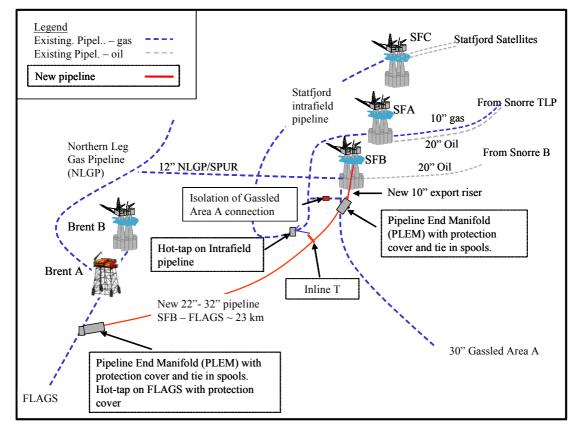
Proposed layout of the SFLL project gas export pipeline and associated risers
